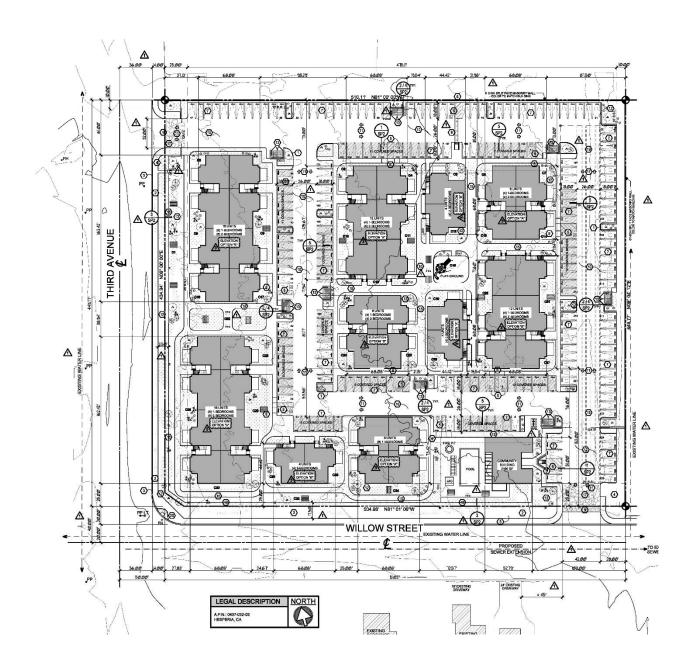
SITE PLAN OF PROJECT SITE
